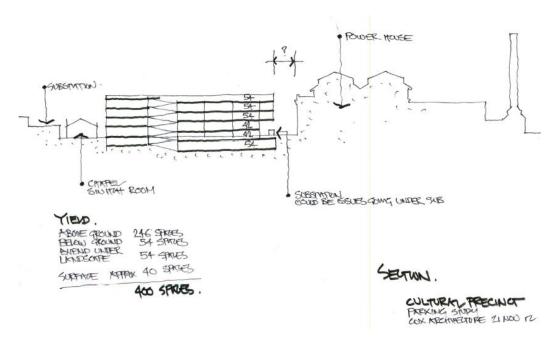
Concept sketch for structured car park between the Power House and the '1948 Switch Room' (2012). Source: Cox Architecture.
